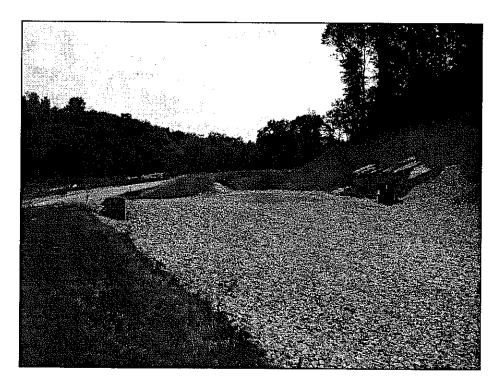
VIEW OF DOWNSTREAM END OF LIMESTONE POND, INLINE STRUCTURES, AND SETTLING POND
